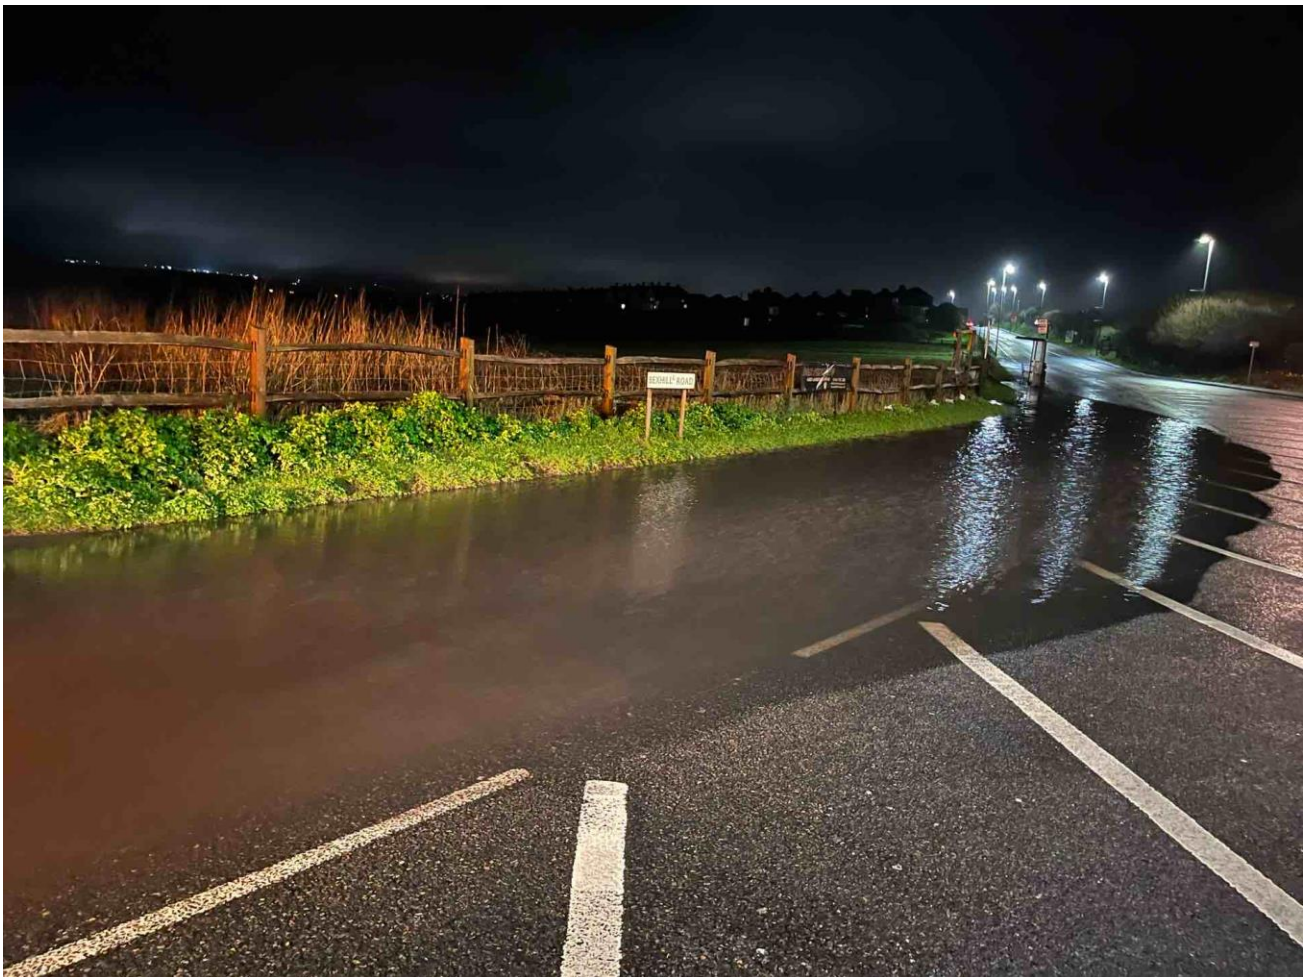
Flooding to carriageway on A259 at Glyne Gap on 23 March 2023 (credit: National Highways)
